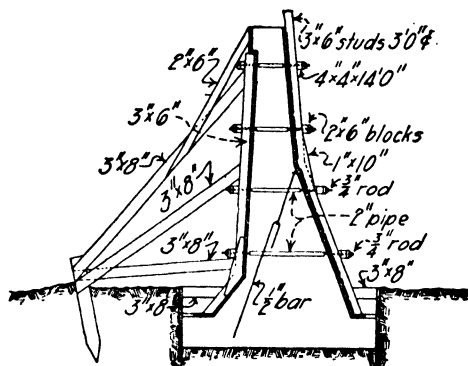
FORMS FOR RETAINING WALL, C. B. & Q. R. R.
